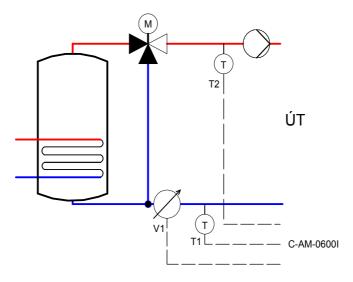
An example of placement of the elements for metering heat consumed by the central heating
